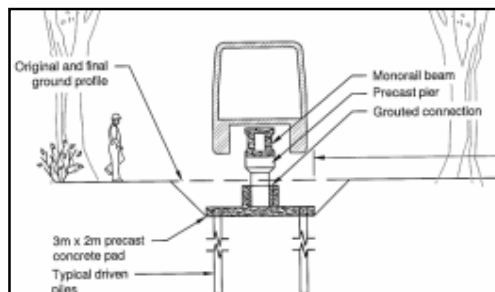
Precast Foundations with driven piles in 'Swampy Bush' terrain
